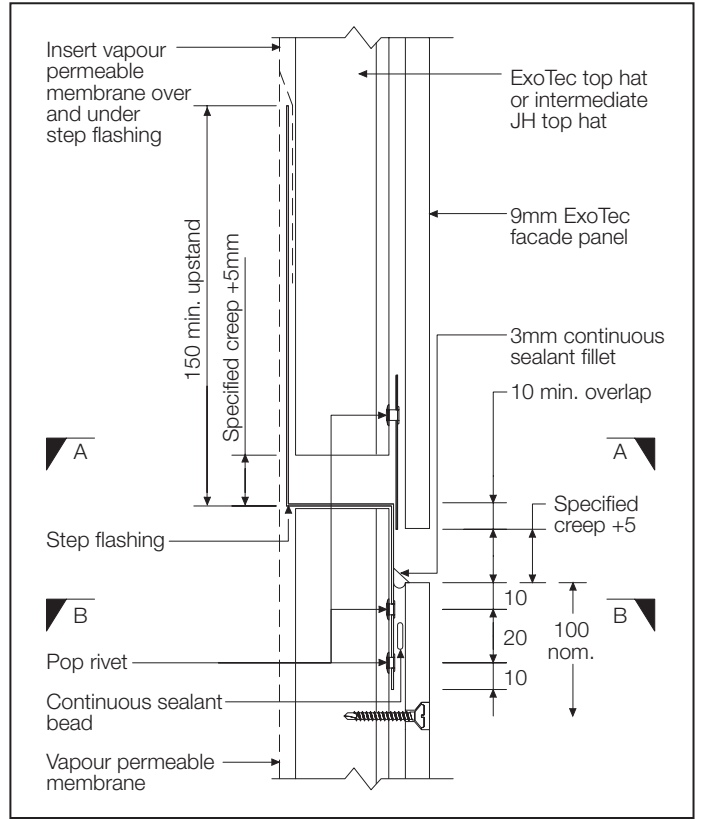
HORIZONTAL STRUCTURAL JOINT DETAIL
